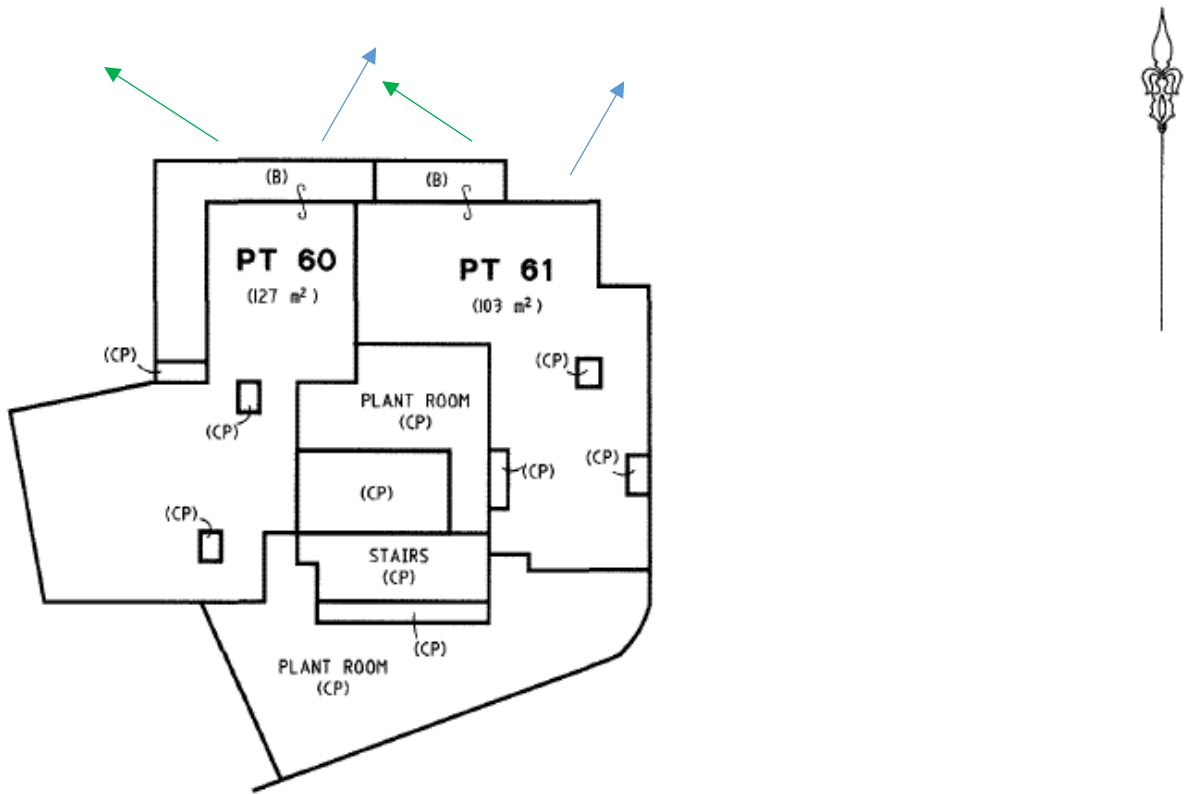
Strata Plan layout of Level 16, at 417-419 Bourke Street, Surry Hills
